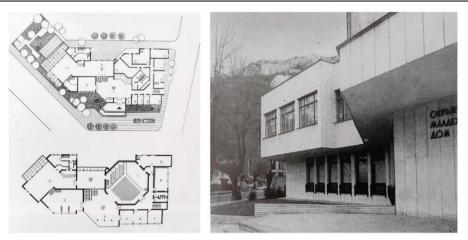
The House of Youth, Lovech, Bulgaria: architectural plans and photo from 1978, source: Architecture magazine №8 / 1978 [12], author's collage
